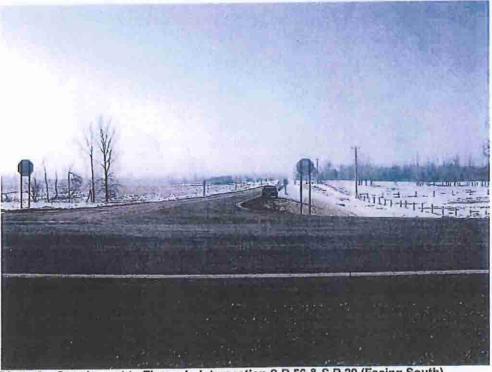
Supplement to Figure 4: Intersection S.R.56 & S.R.29 (Facing South)
